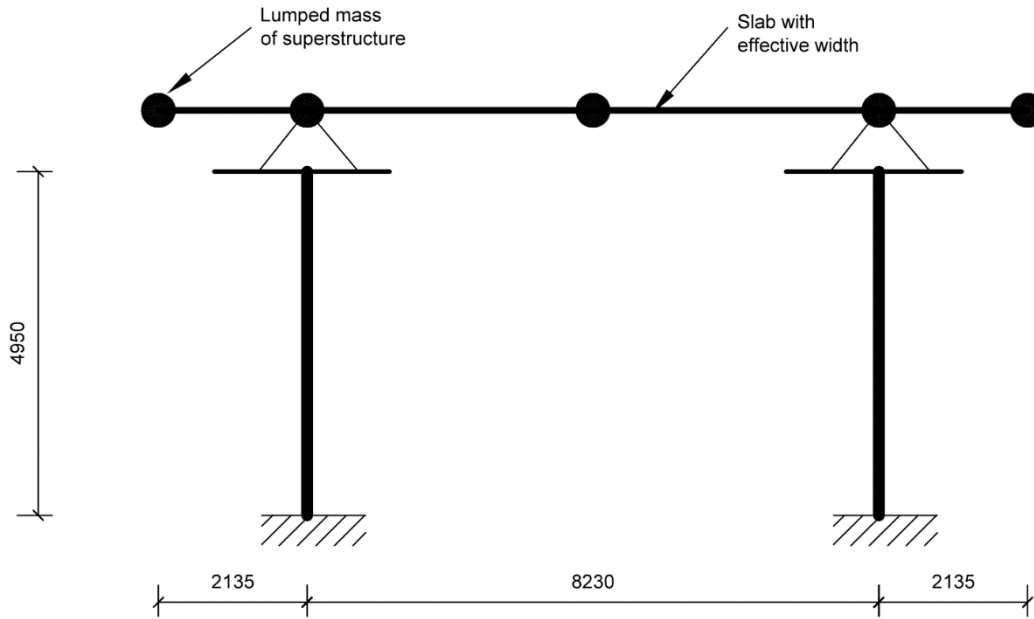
Finite element model of Bridge #4 in the transverse direction.
